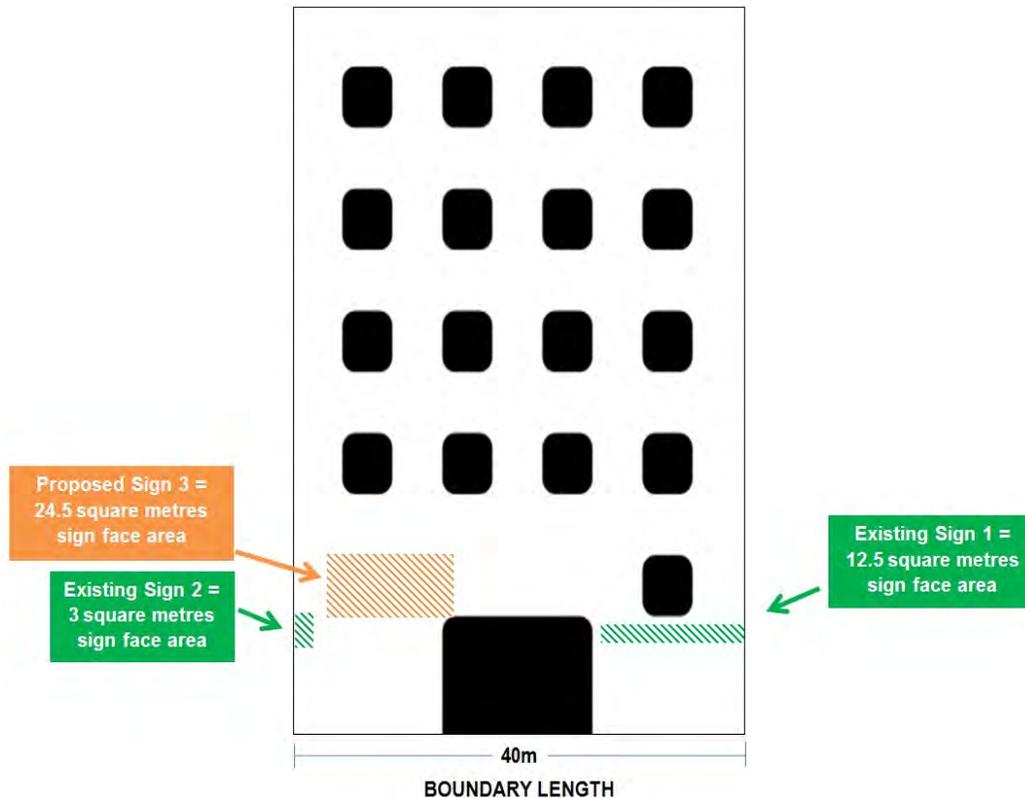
Front view of building for calculating total sign face area
